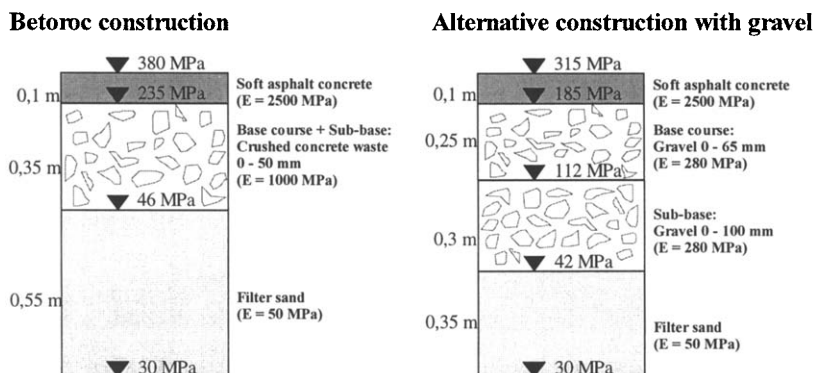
Design of a construction with crushed railway sleepers and hollow core slabs compared to an alternative construction with gravel.
